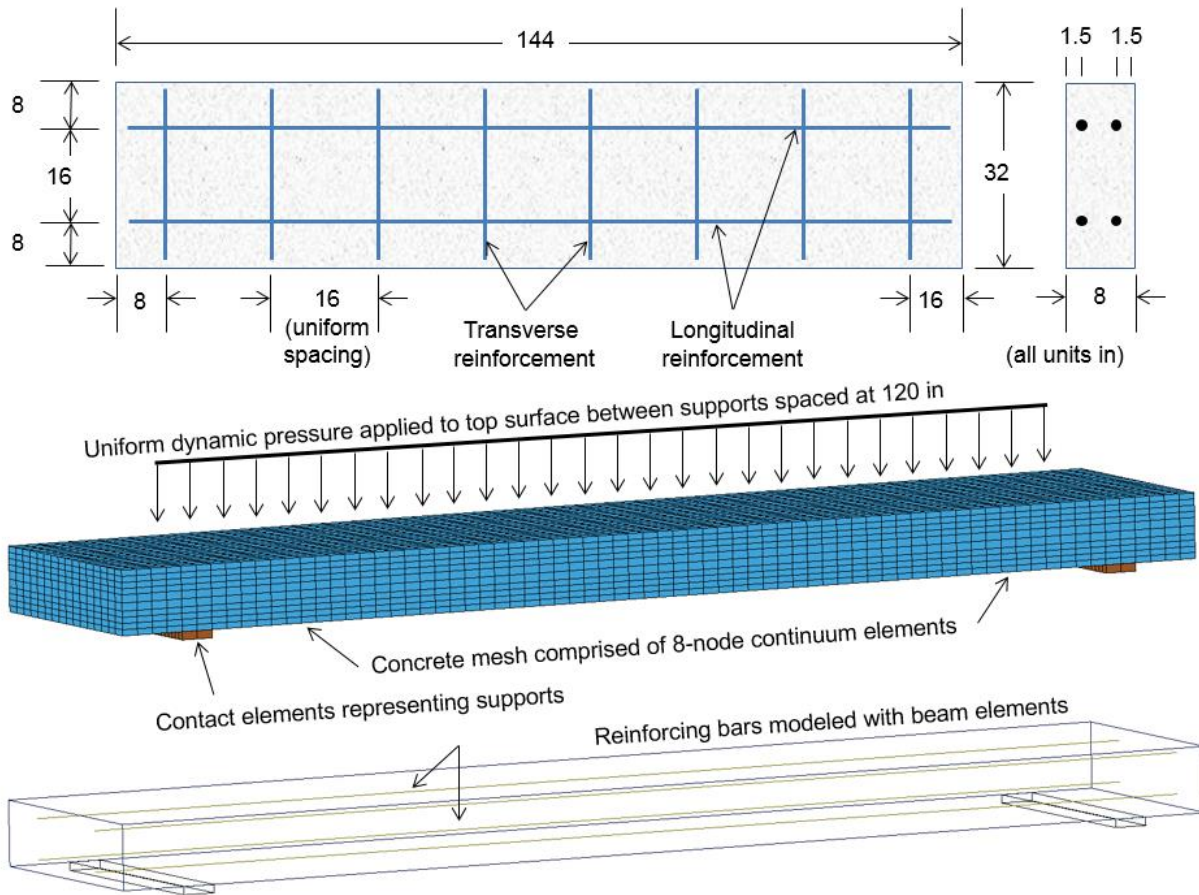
Finite Element Reinforced Concrete Wall Panel Model
